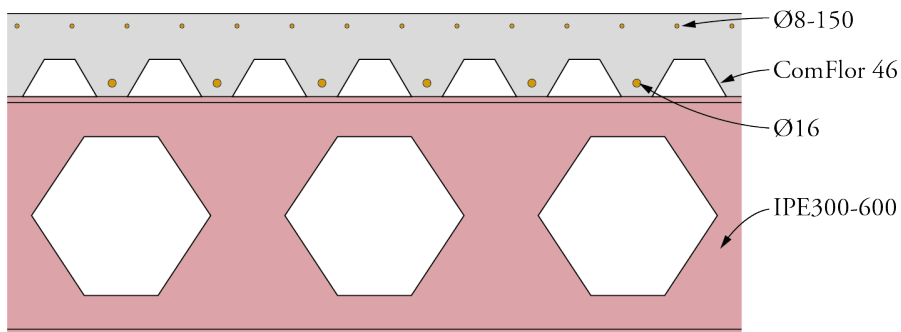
Sketch impression of the composite floor configuration on castellated beams.
